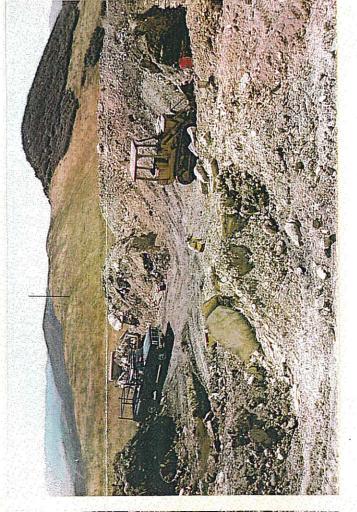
451 CATERPILLAR FRONT END LOADER
